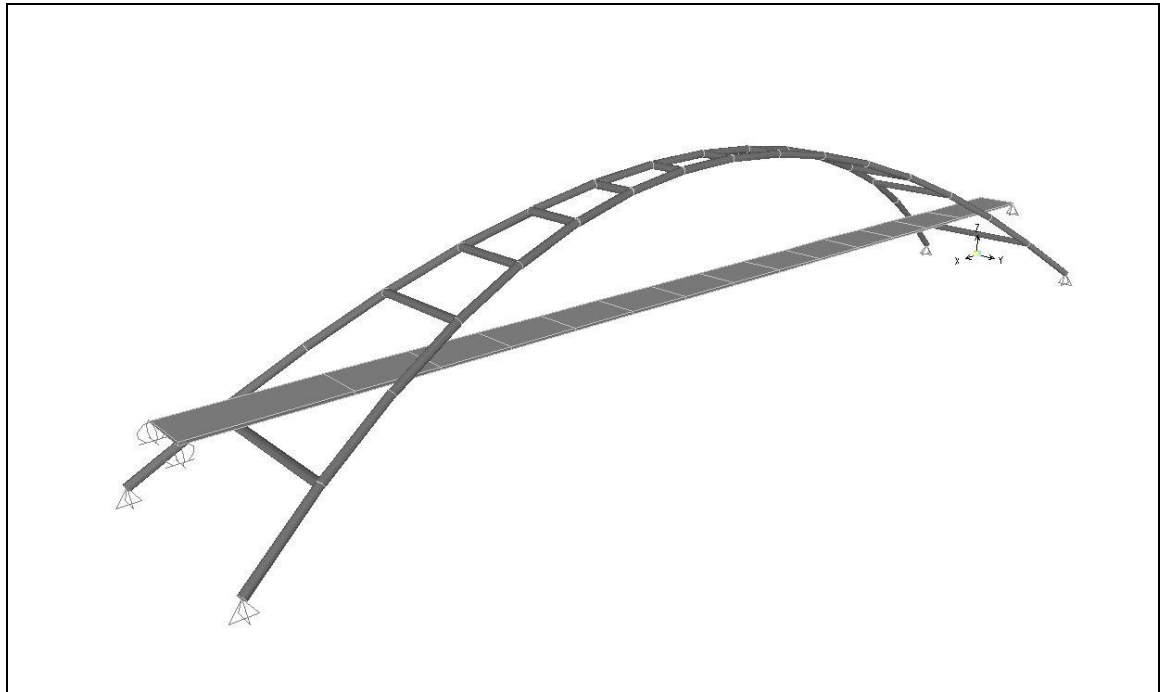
Bridge with deck drawn in (cables removed for clarity).
